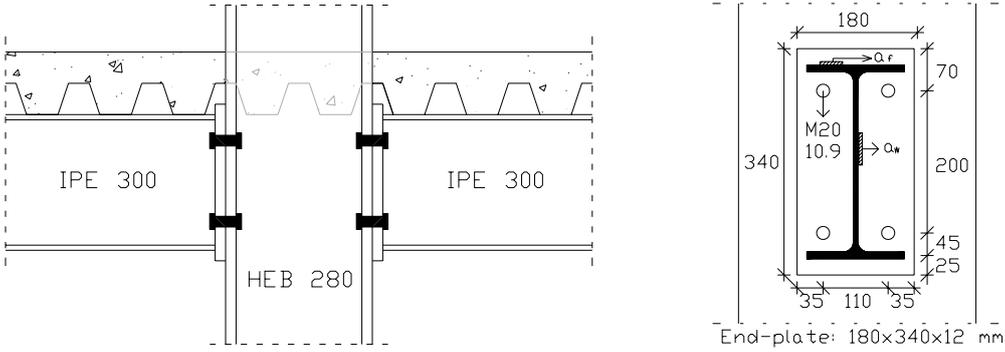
internal composite joint and joint details of the “Bochum” building
